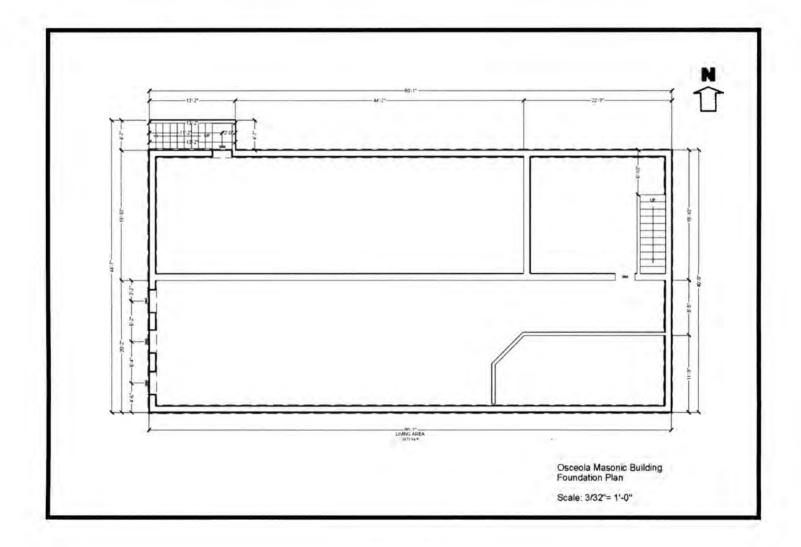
Basement Floor Plan (Ryan Lundquist Plan, 2009)
